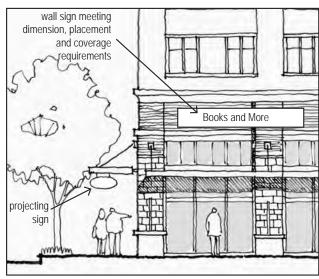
d.1 & 2: Ground-floor sign diagram
